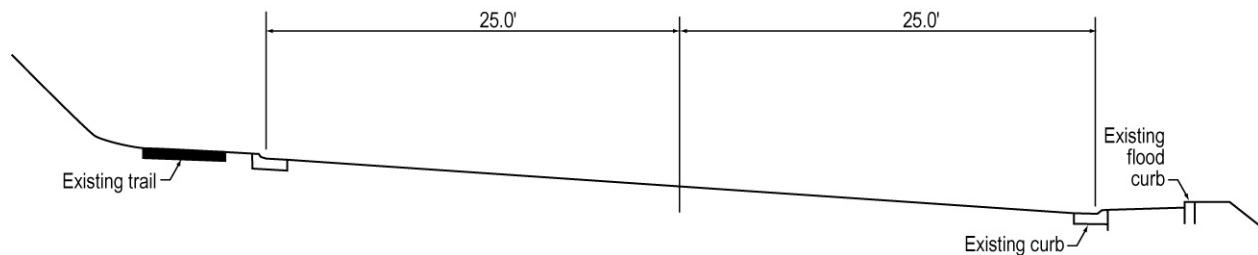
Existing cross section of Rock Creek and Potomac Parkway
